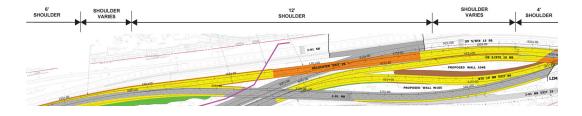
Alternative P5A – Construct New Exit 29 Bridge over Route 5/15 Southbound with a 4-foot Left Shoulder, 12-foot Lanes, and a 10-foot Right Shoulder
